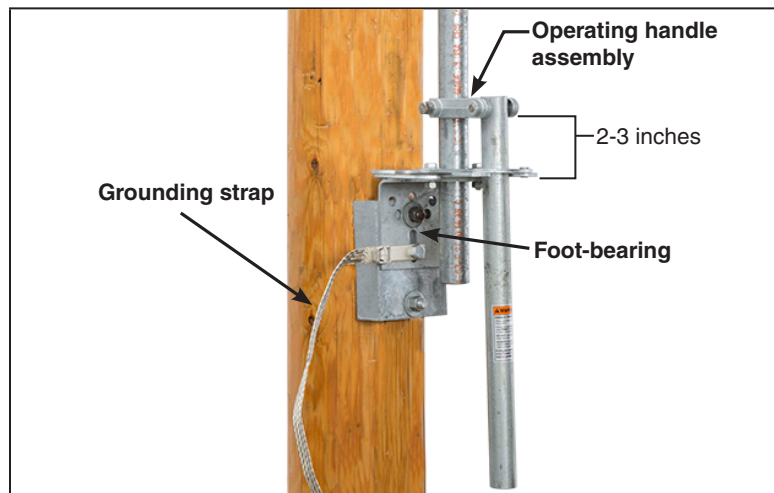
Install the foot-bearing assembly so the handle is two to three inches above the foot-bearing assembly.
